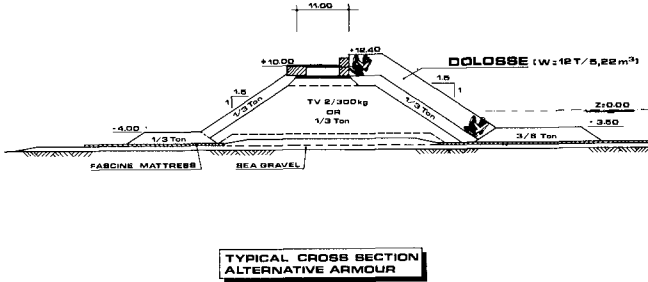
Typical cross-section NW/NE-breakwater with dolosse armour revetment
